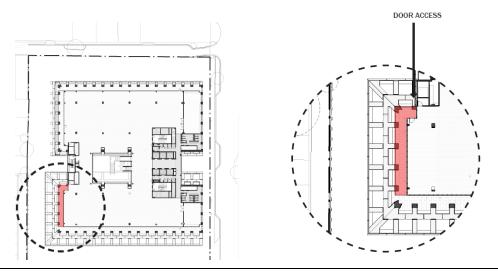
The location of the proposed level 05 south-west terrace (left), high level detail plan (right)
